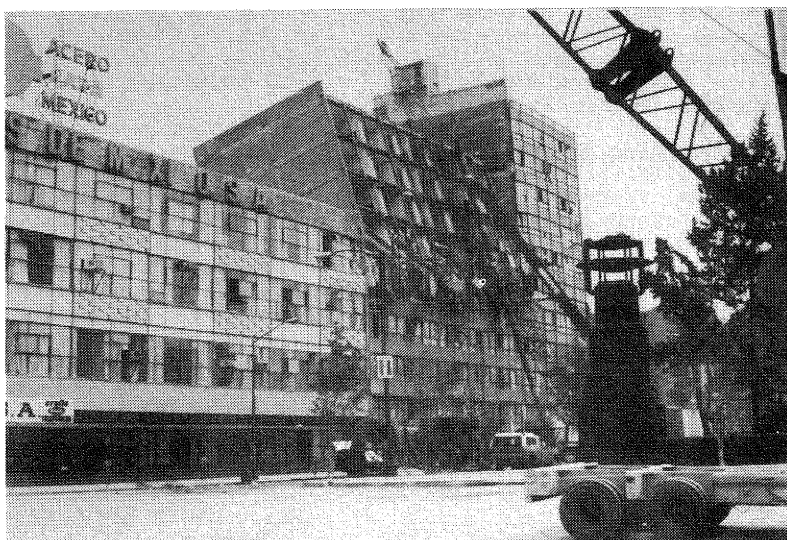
Collapse of the Hotel de Carlo due to Column failure at rear.
